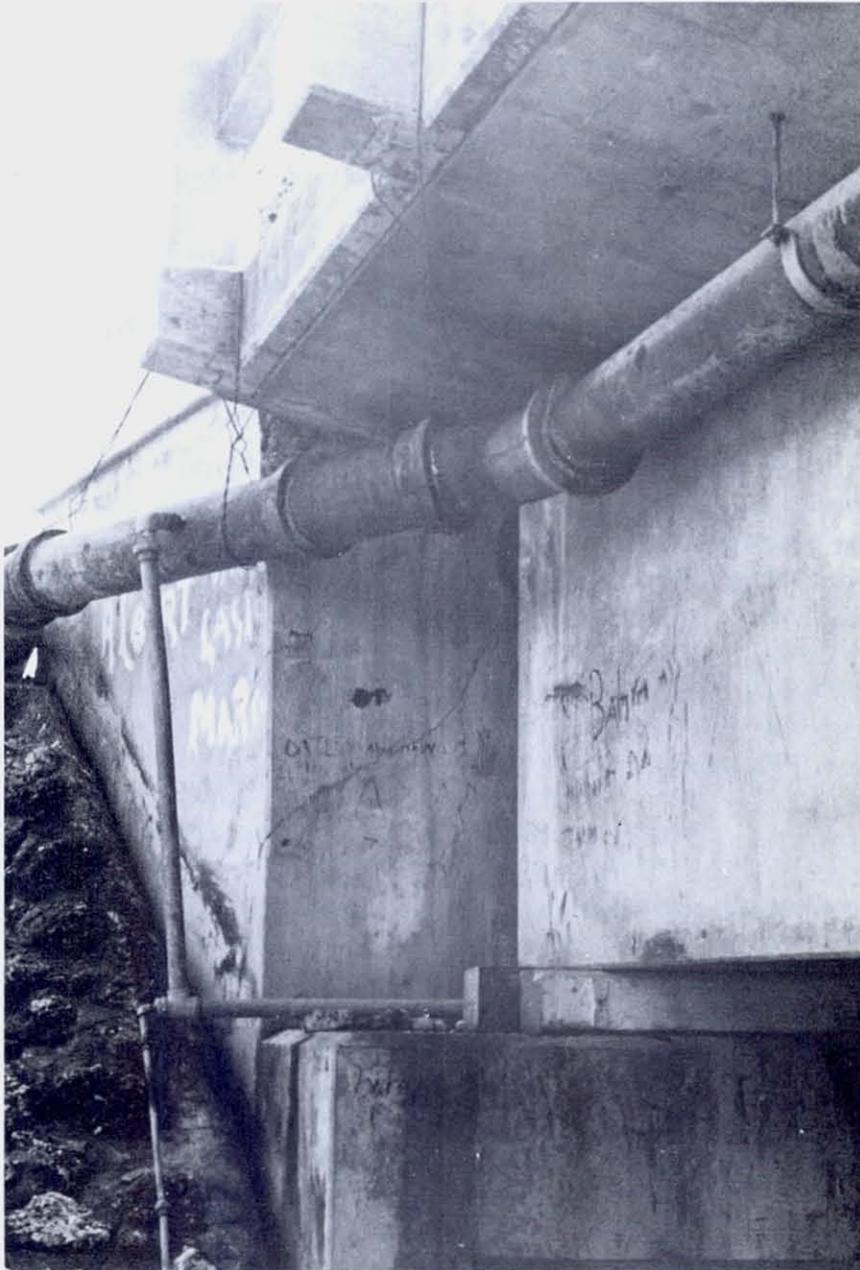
Shearing of Pipe at Tamontaka River Bridge
